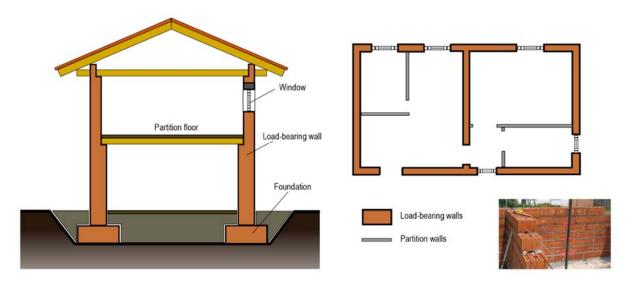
Load-bearing wall buildings scheme (Source: tecnologiaedidattica.com)
